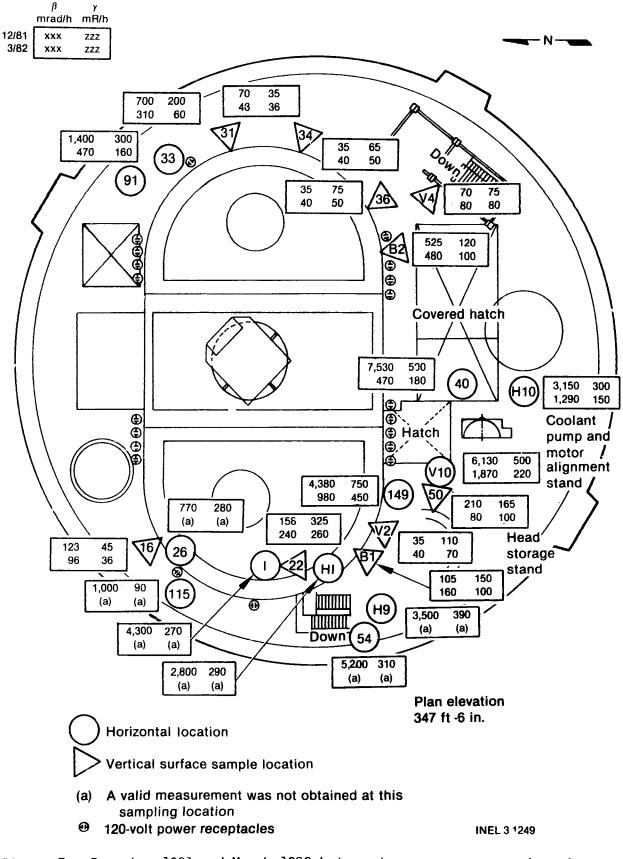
December 1981 and March 1982 beta and gamma exposure rates at elevations 347 ft,6 in., 367 ft,4 in., and 369 ft,6 in. (shown on the 347 ft,6 in. elevation floor plan).
